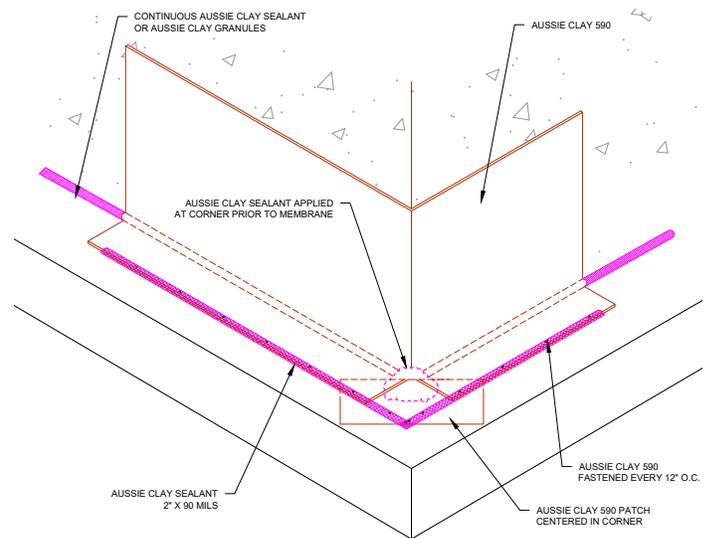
OUTSIDE CORNER EDGE - NH
